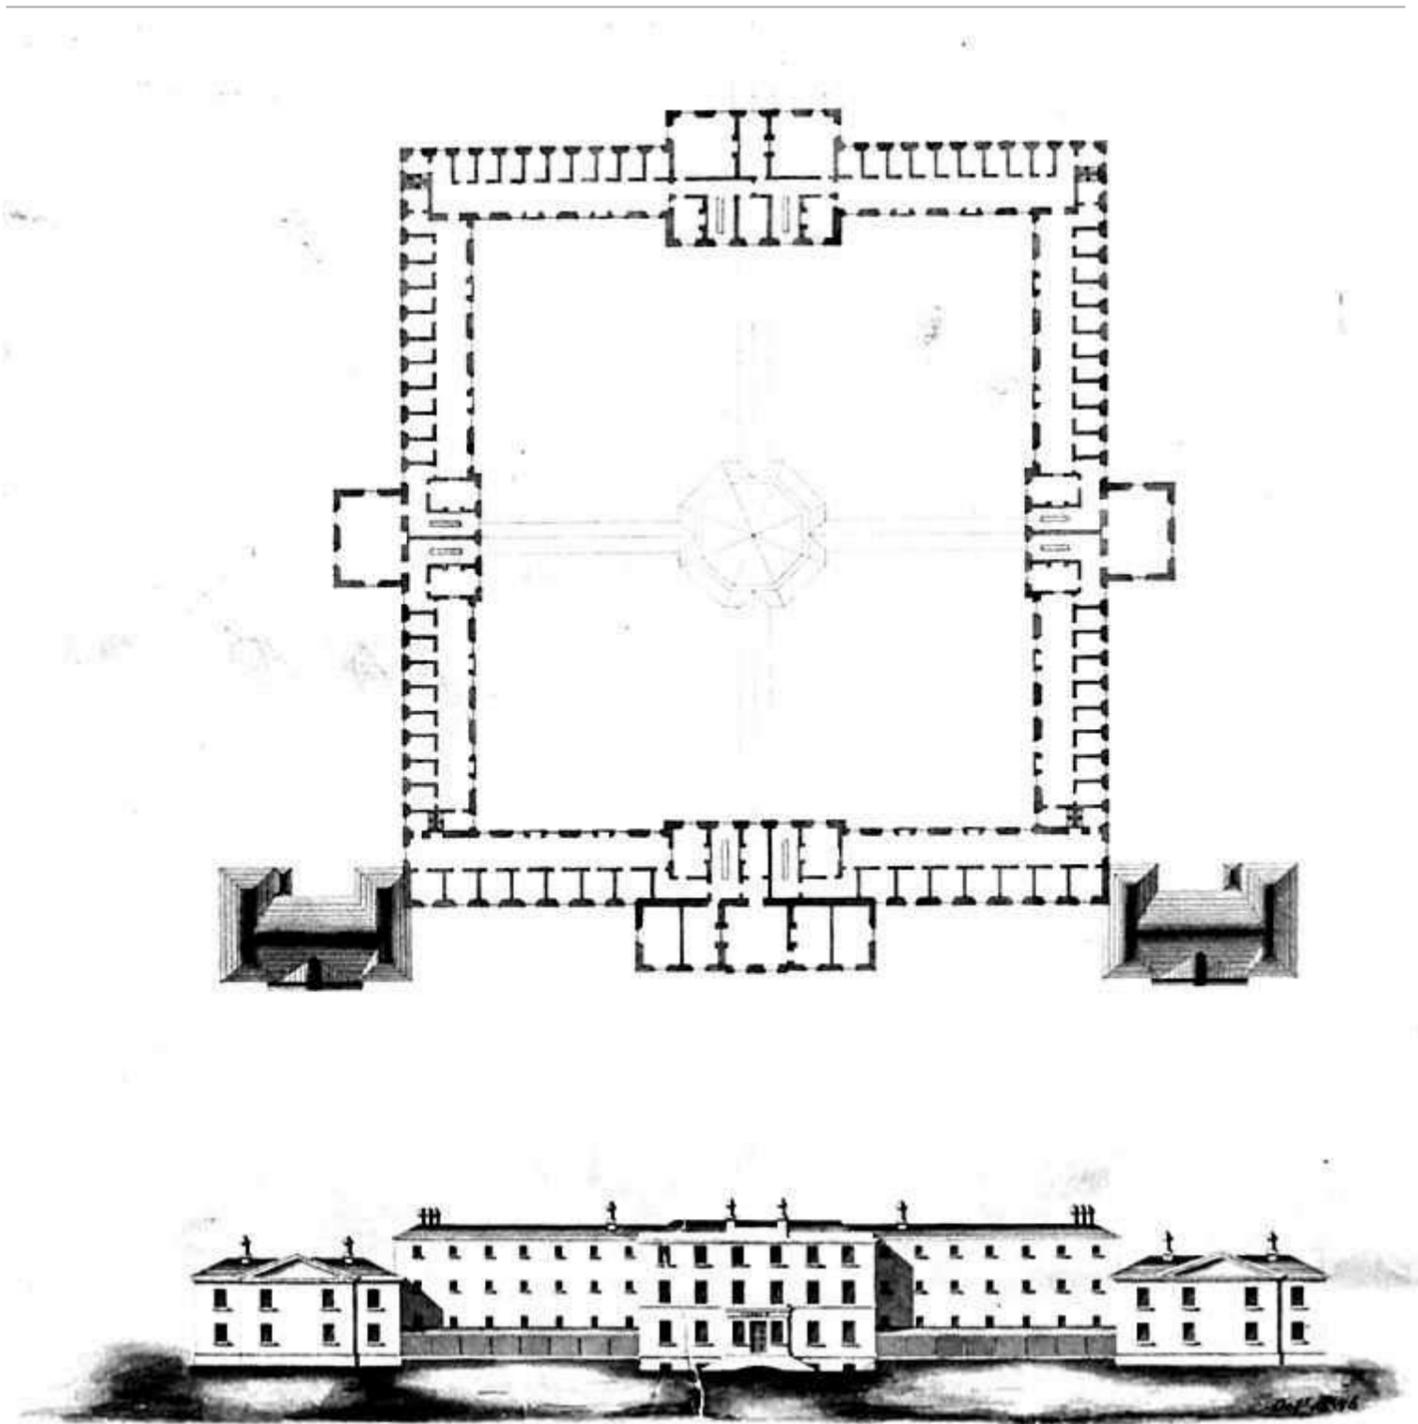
3 Original plan and elevation drawings of the Lower House (Former Richmond Lunatic Asylum).
